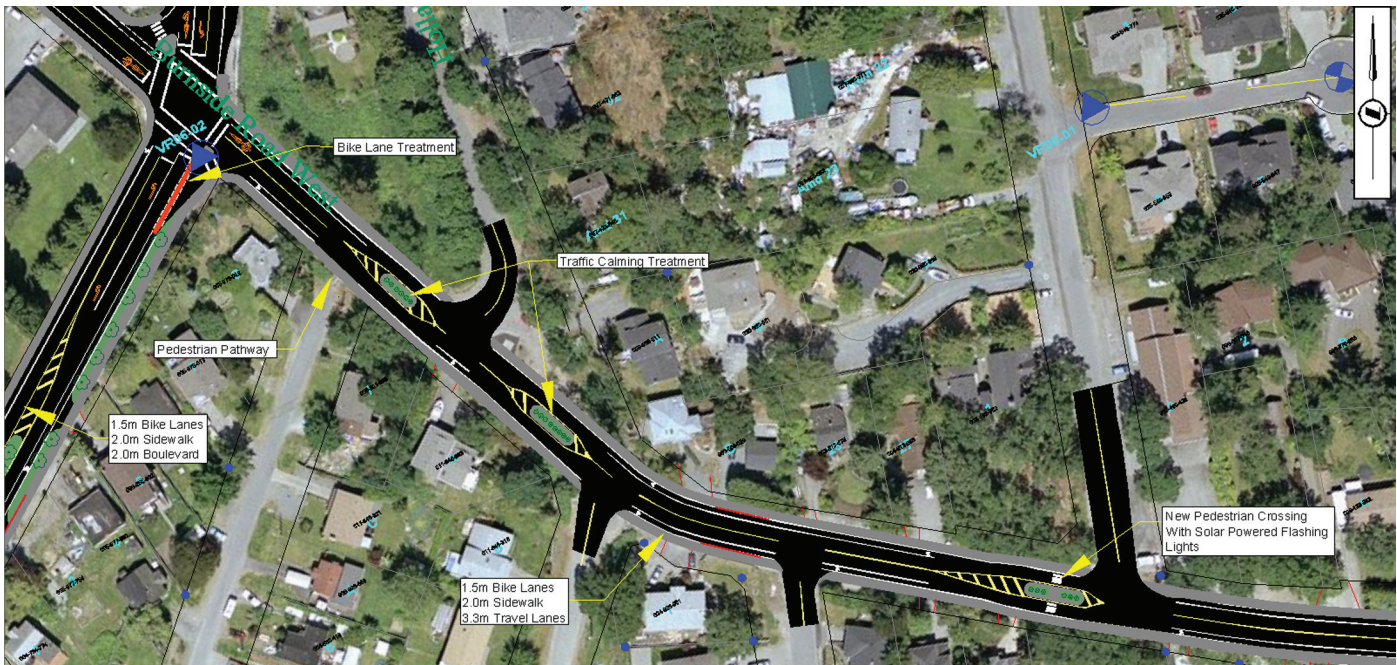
Burnside Road West from Helmcken Road to Saanich Municipal Border
